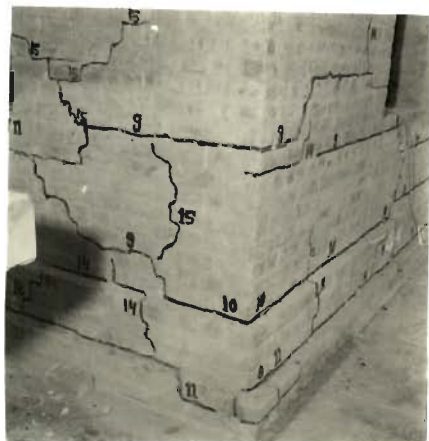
\_ NORTH - WEST CORNER BOTTOM REGION DAMAGED (MODEL 4)
